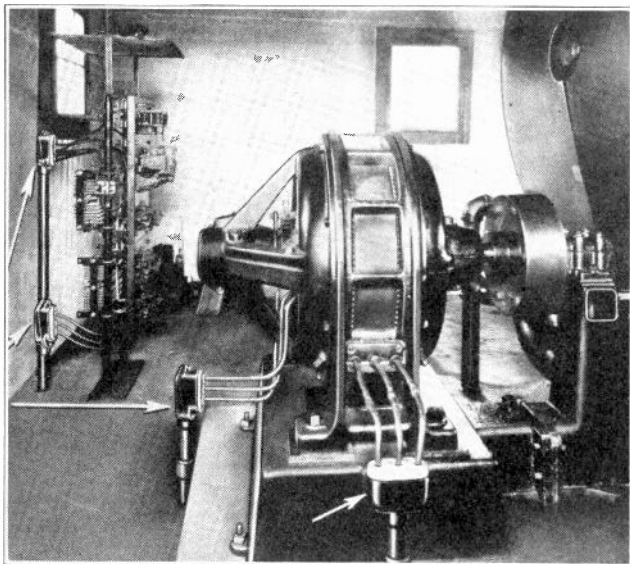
This photo shows a very neat installation of the wiring to a slip ring motor and its controller. Courtesy of Crouse Hinds Co.
